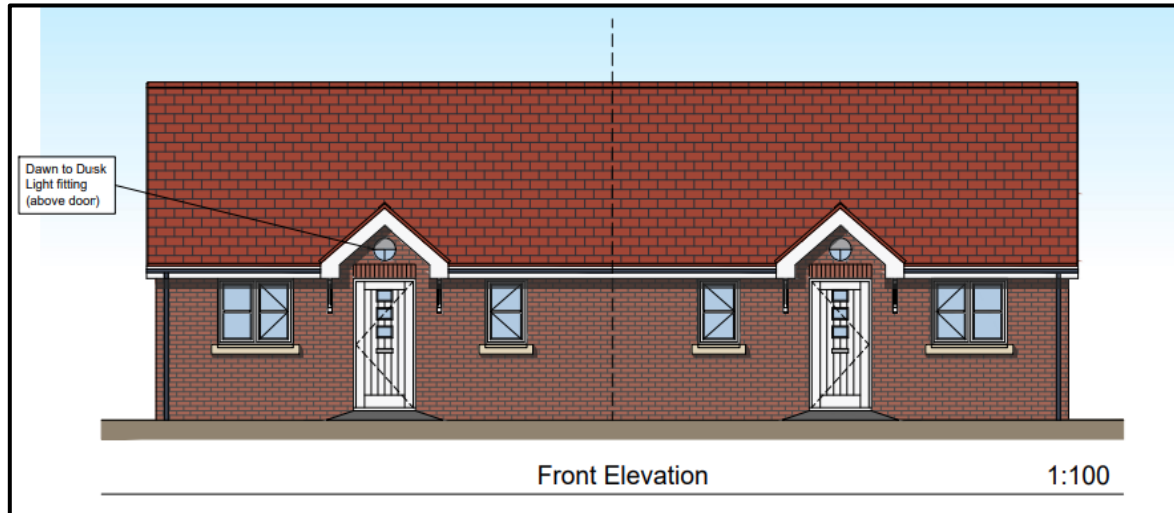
Typical 2p1b Semi Detached Bungalow with brick finish
